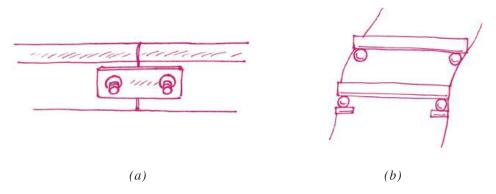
(a) Gap in railway tracks (b) Girders in iron bridges placed on rollers
